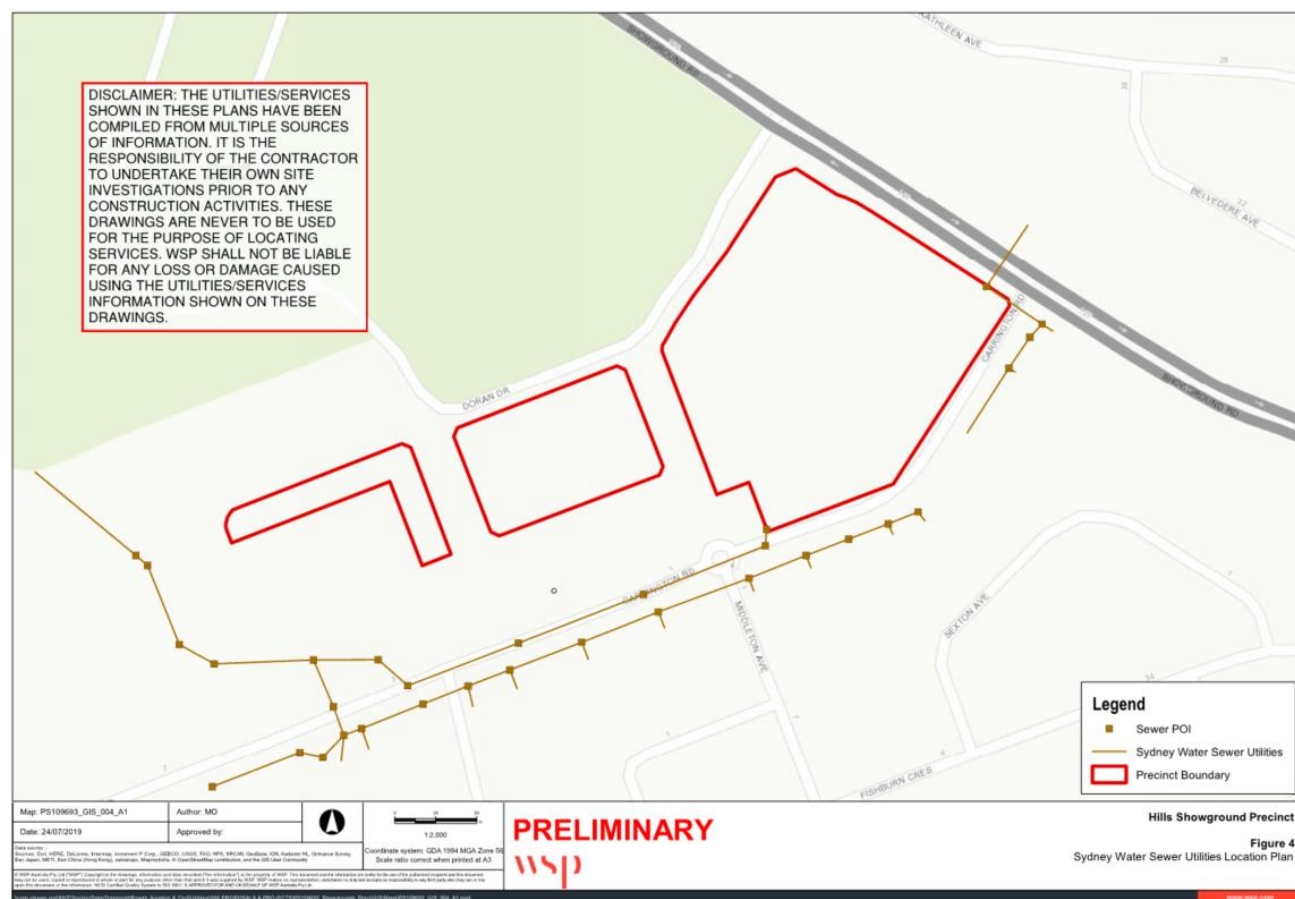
Existing Sewer Infrastructure Indicative Layout
